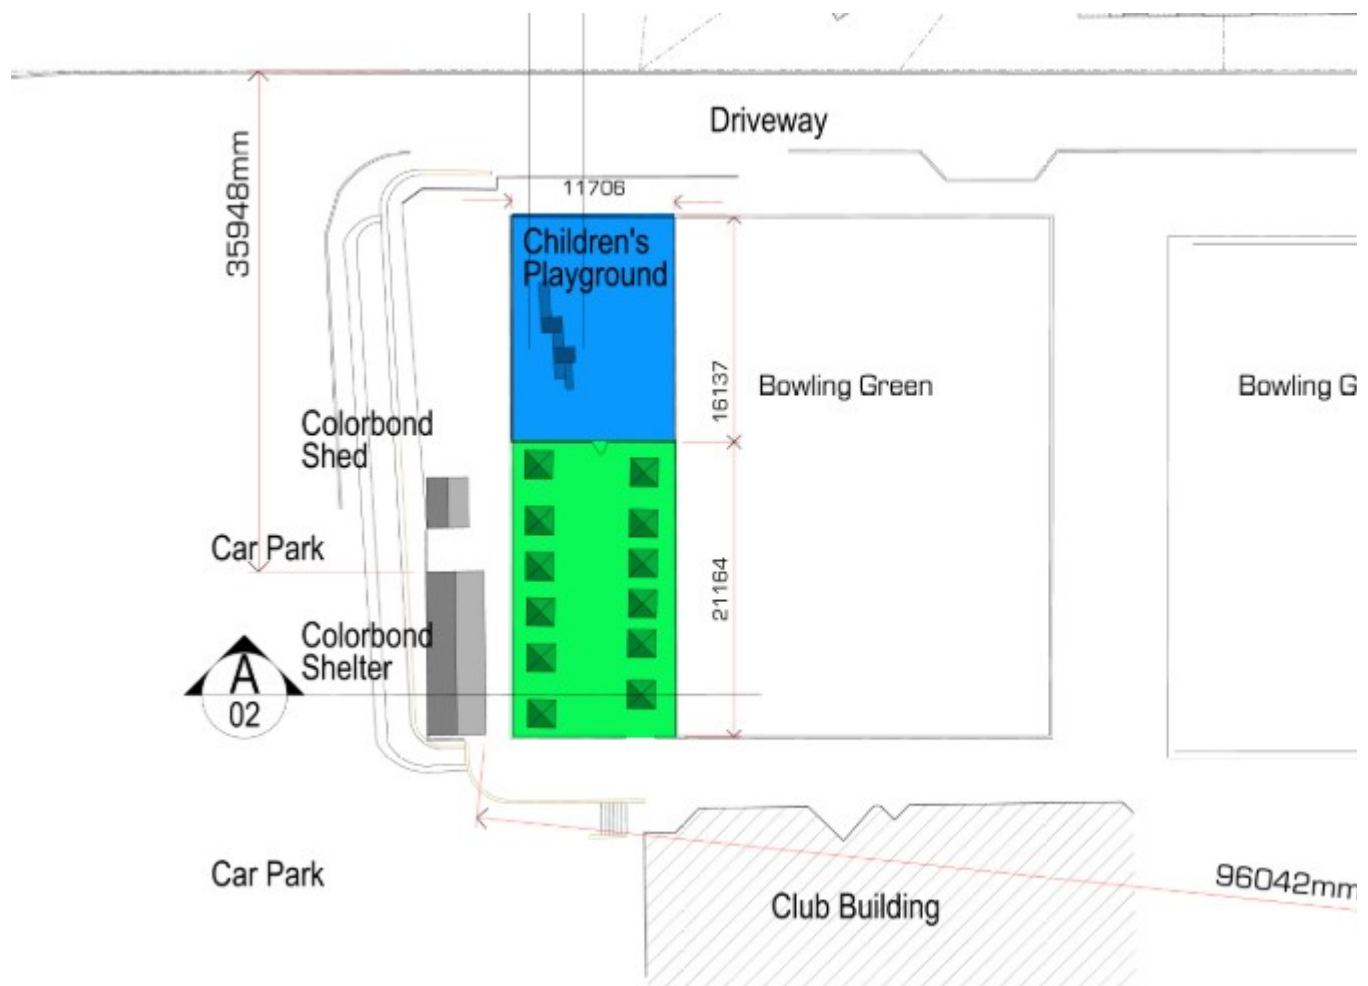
Proposed outdoor seating (green) and children's playground (blue).
